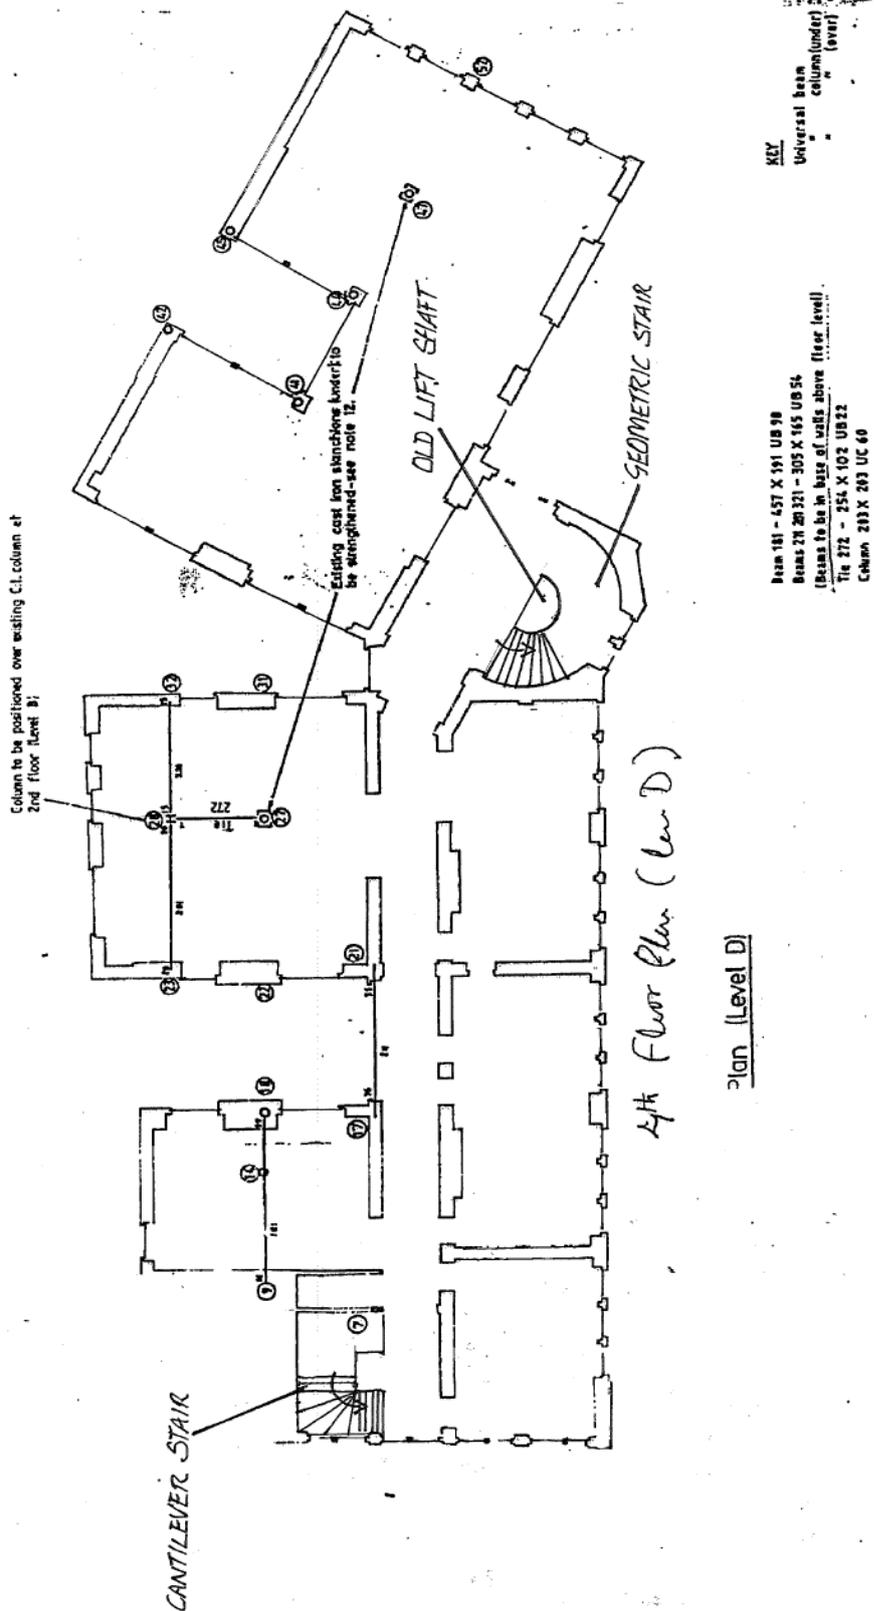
Annotated plan of the building's 4th floor c1980 supplied by Crossrail
